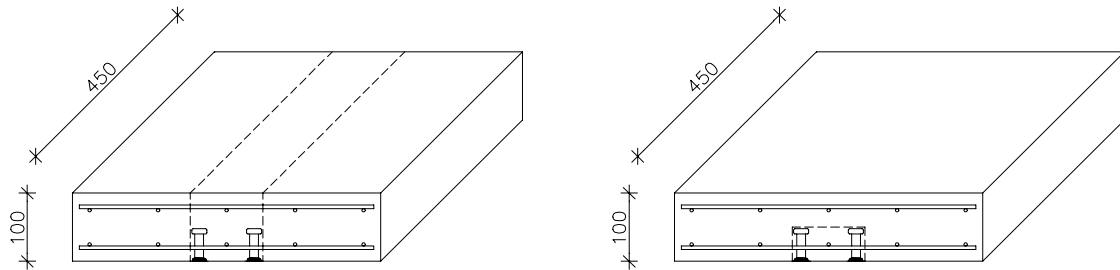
Longitudinal shear failure plane 1 (left) and longitudinal shear failure plane 2 (right)
